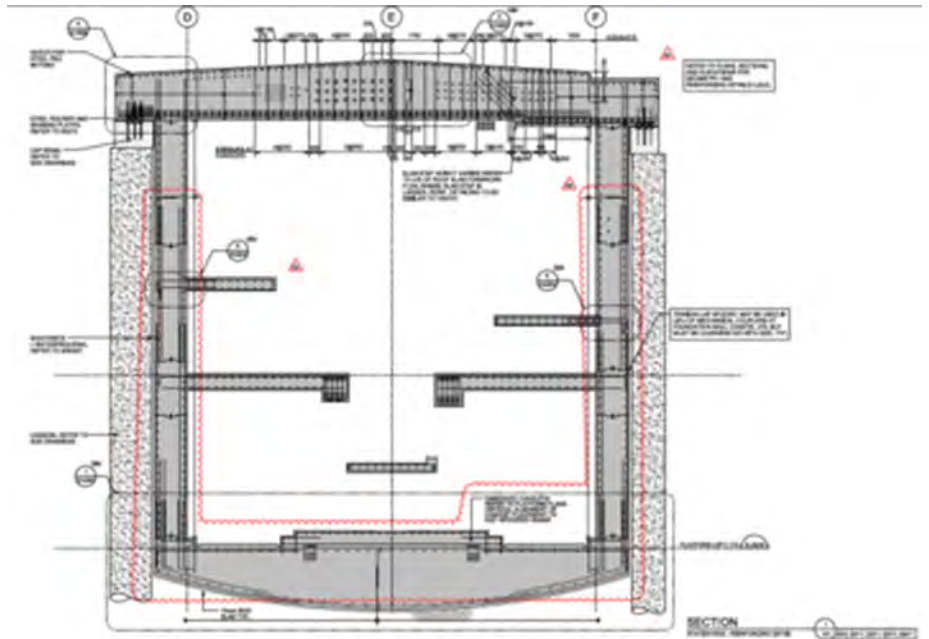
Typical 1.3 m thick perimeter station wall details that were constructed using shotcrete. Note: Invert slabs were constructed using cast-in-place-concrete methods.
